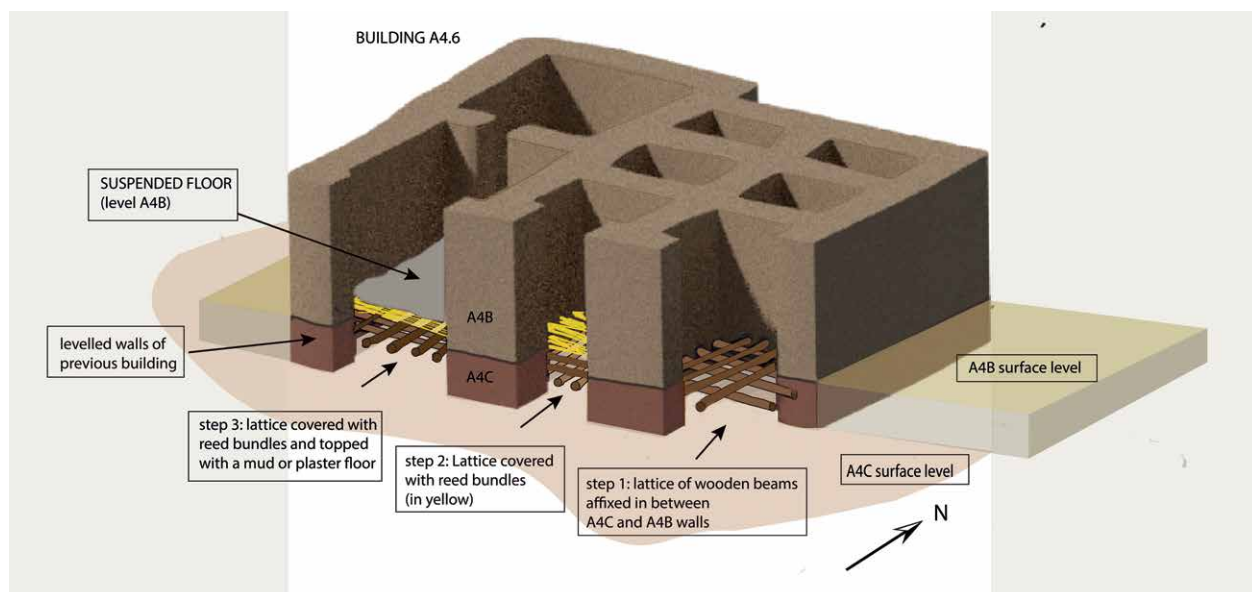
Reconstruction of suspended floor construction in square G4, building A4.6 (image by author).
